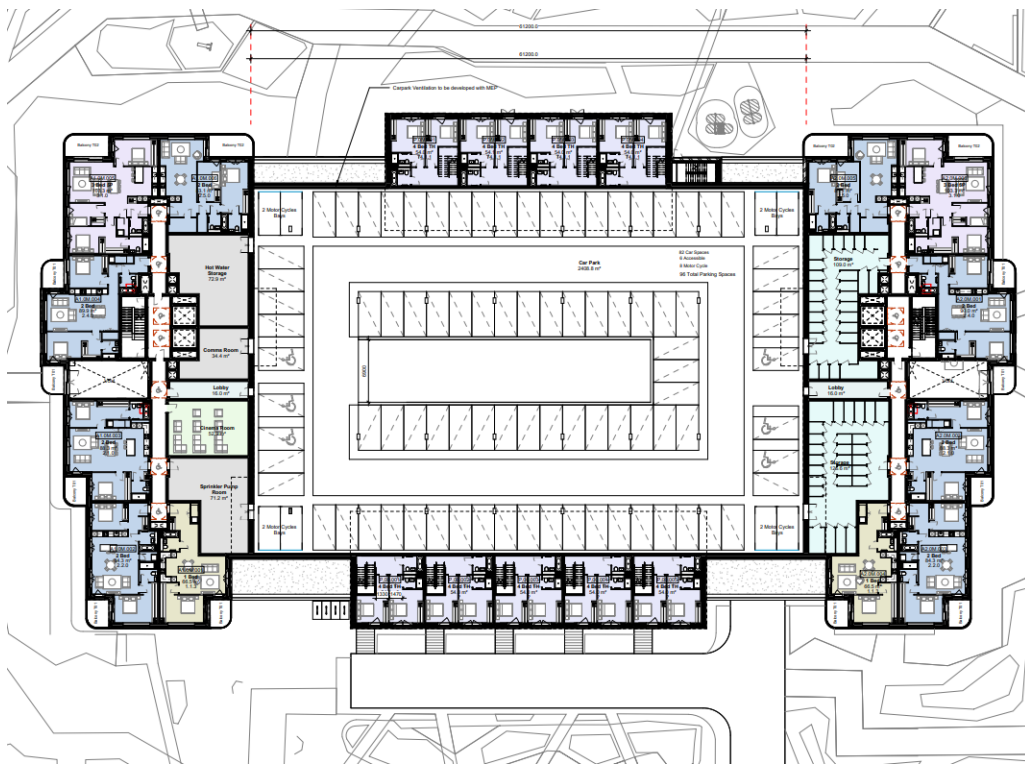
Car Parking Layout for Mezzanine floor plan.
